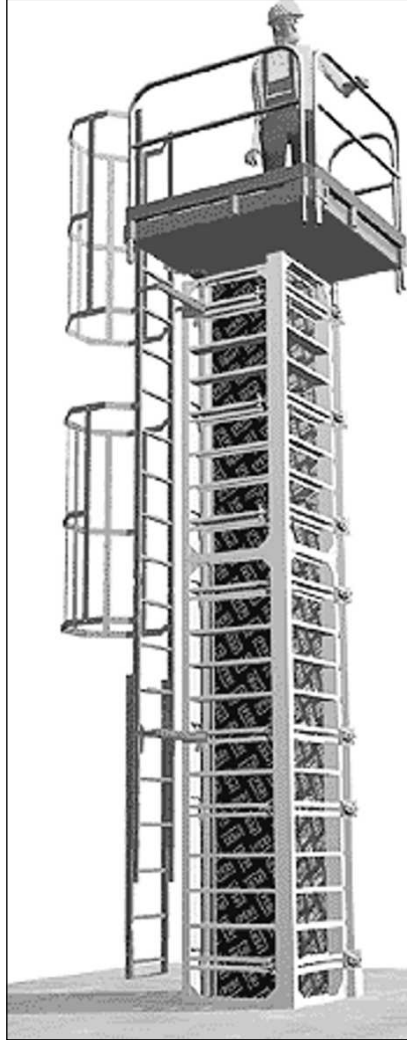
Rapid Column Formwork (Courtesy PERI). Alignment Props Not Shown for Clarity.
